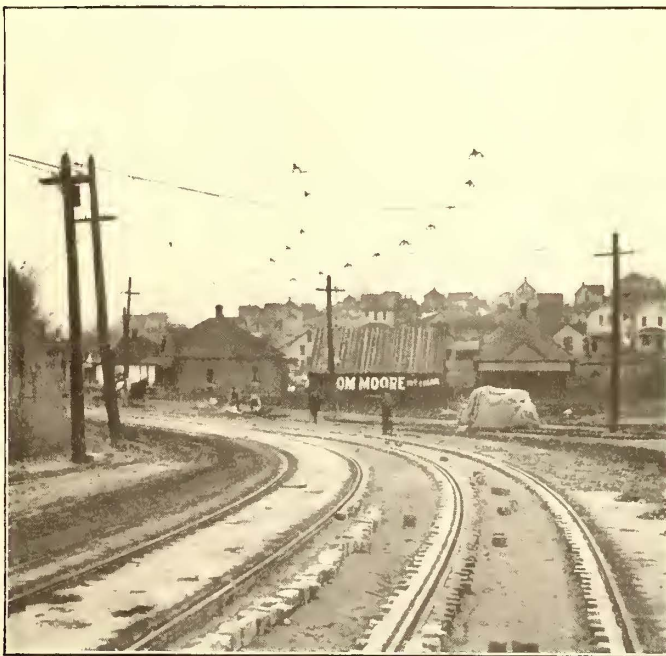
VIEW ON CENTRAL AVENUE, SHOWING METHOD OF LAYING PAVING
